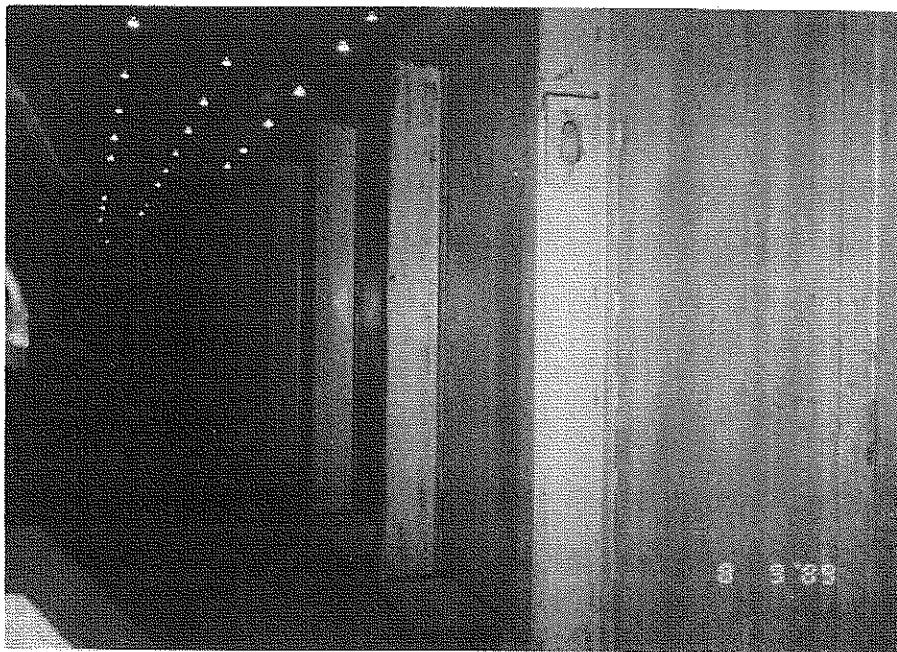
Northeast view of Railroad Container Storage Area (SWMU 4). Note staining throughout area.
